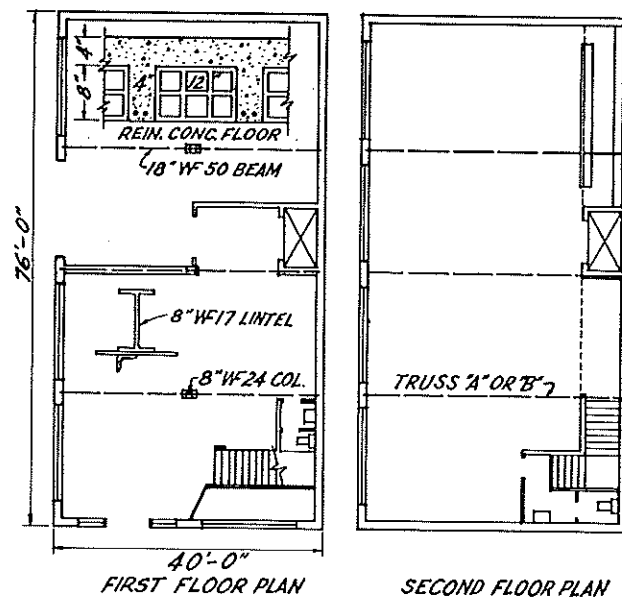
First- and second-floor plans of store shown in Fig. 21.16. The interior of the building may be divided by non-bearing partitions into desired spaces, i.e., washroom, office, stock room, sales room, etc.
